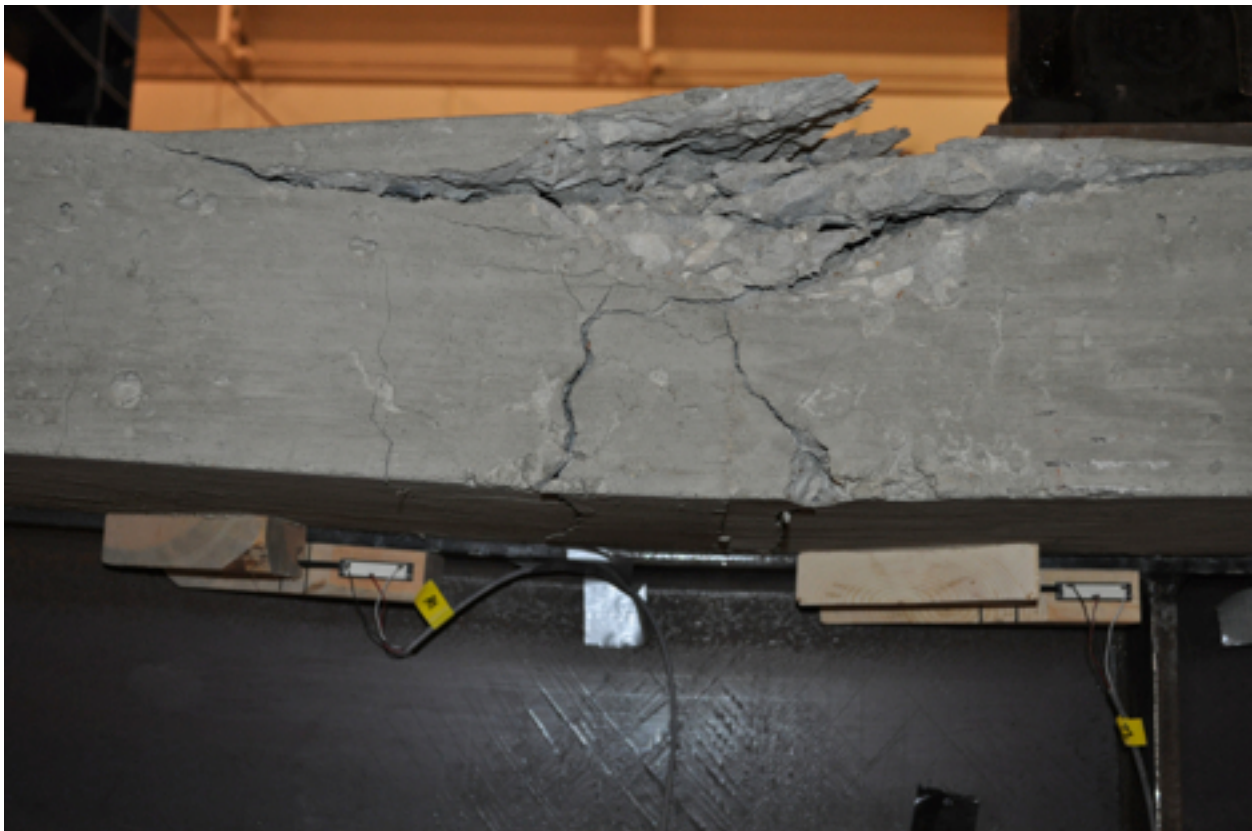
Concrete deck failure of Specimen 2
